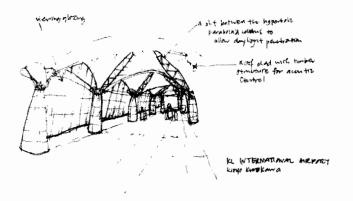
Showing the 'hyperbolic-paraboloid' roof form of the KLIA and its glazed perimeter wall
